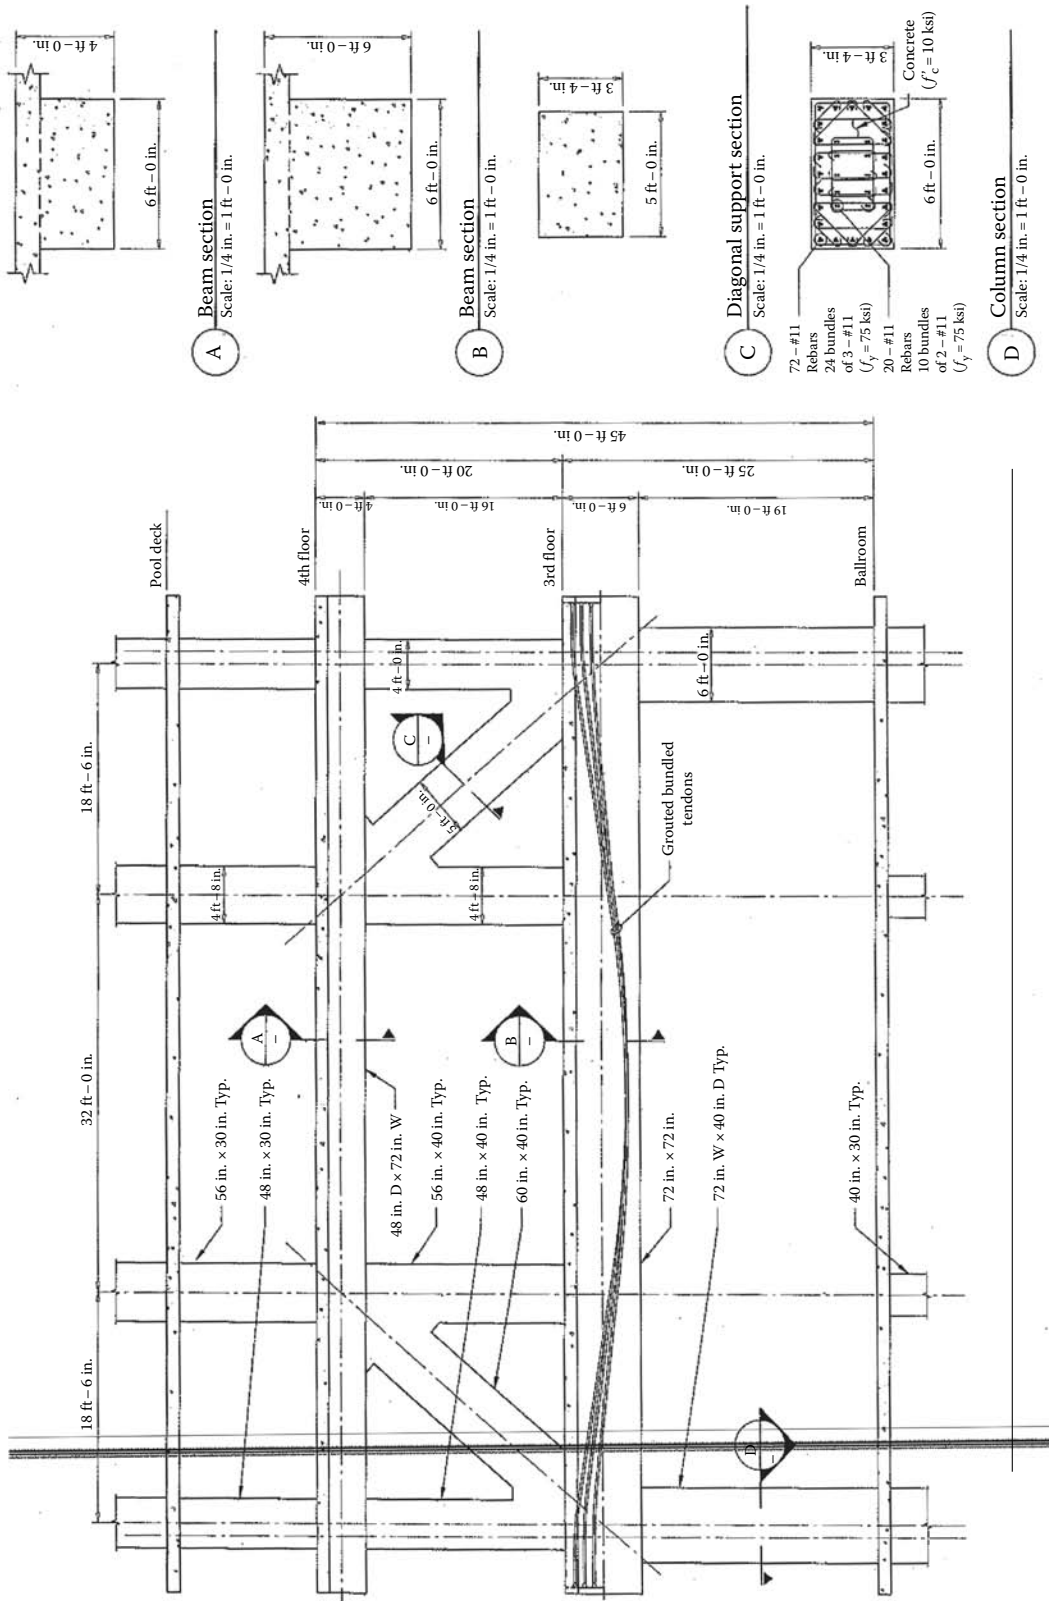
Tension member in a transfer truss. *Note:* Column C not required for truss action but recommended.
